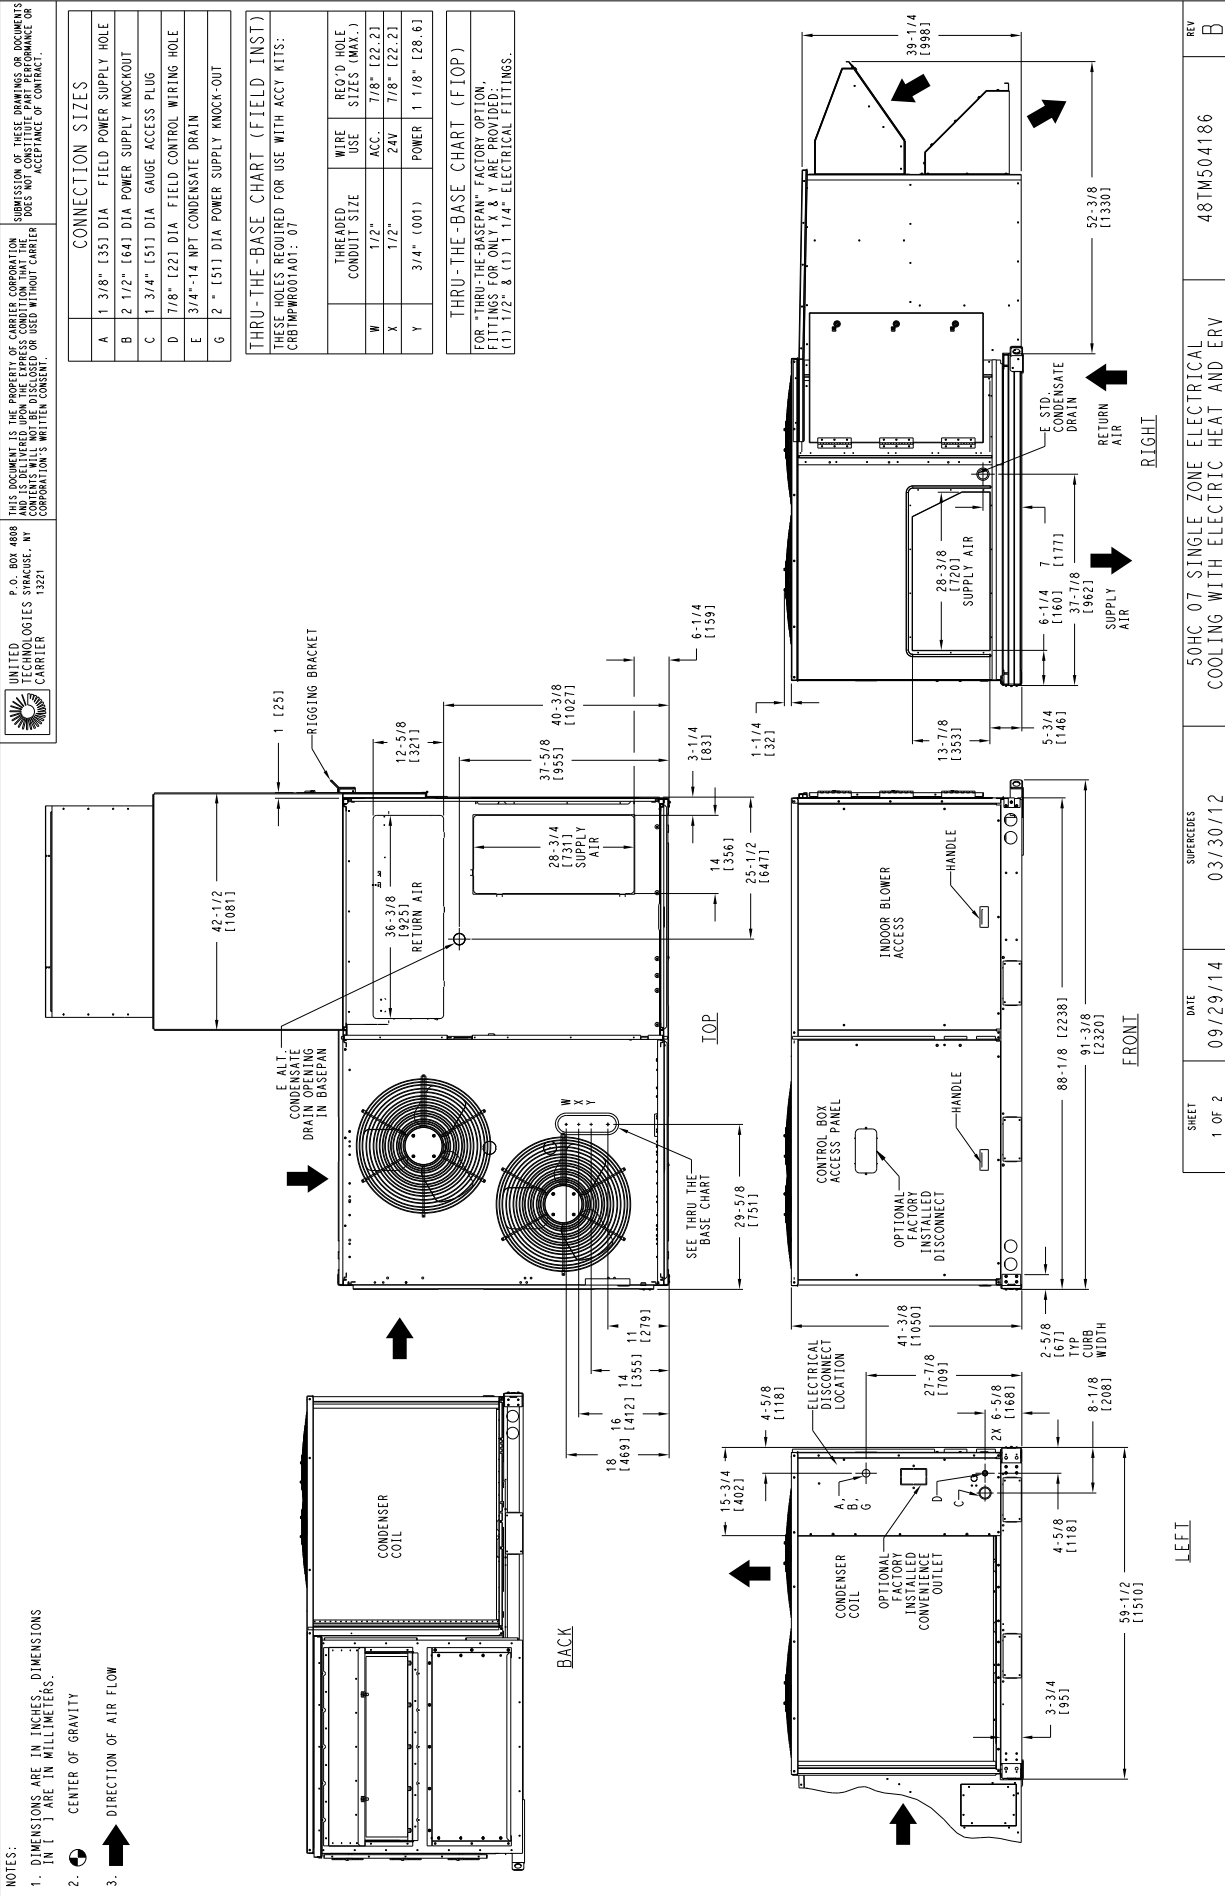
50HC-07 Single Zone Electric Cooling with Electric Heat and ERV (Sheet 1 of 2)
